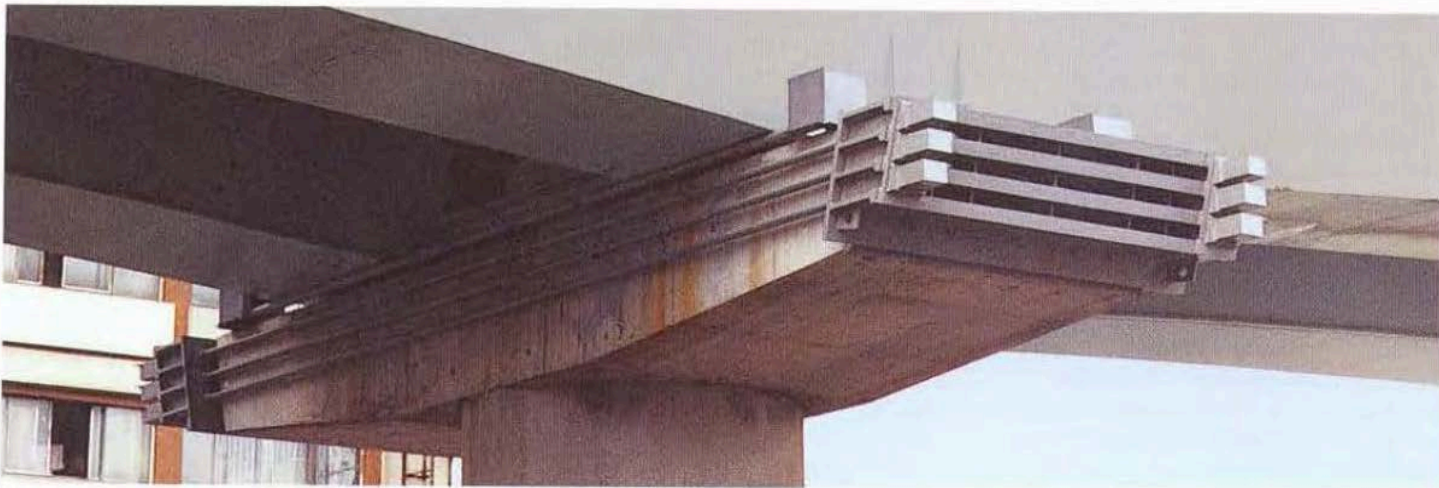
Structural steel saddle is attached to the bottom of a beam, serving as a low point deflector or deviator
